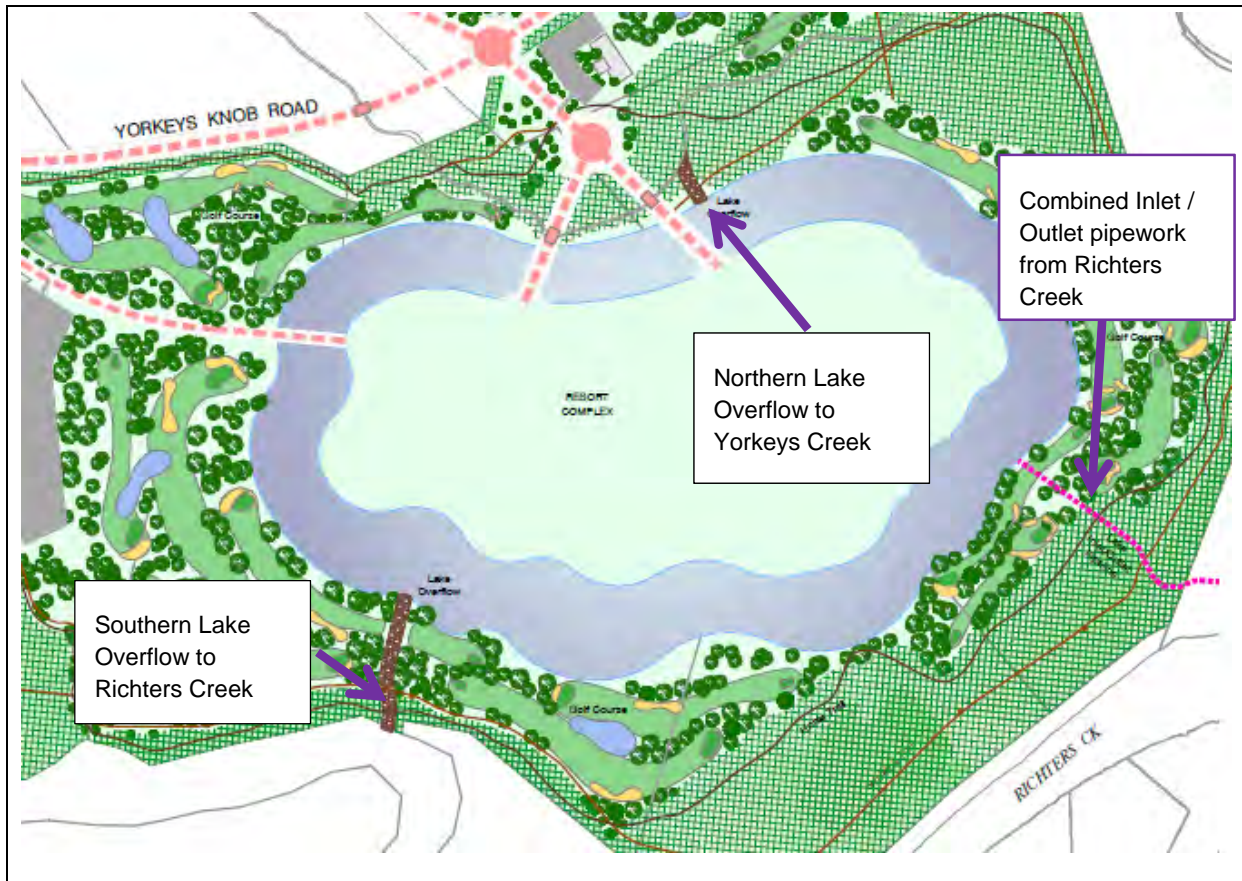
Lake concept plan showing inlet, outlet, and overflows.
